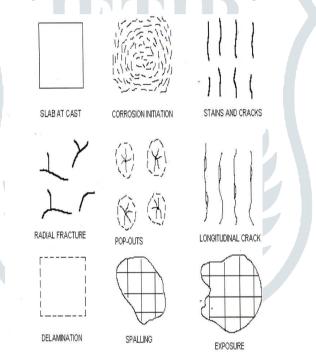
Typical Symptoms of Corrosion in a Reinforced Concrete Slab
